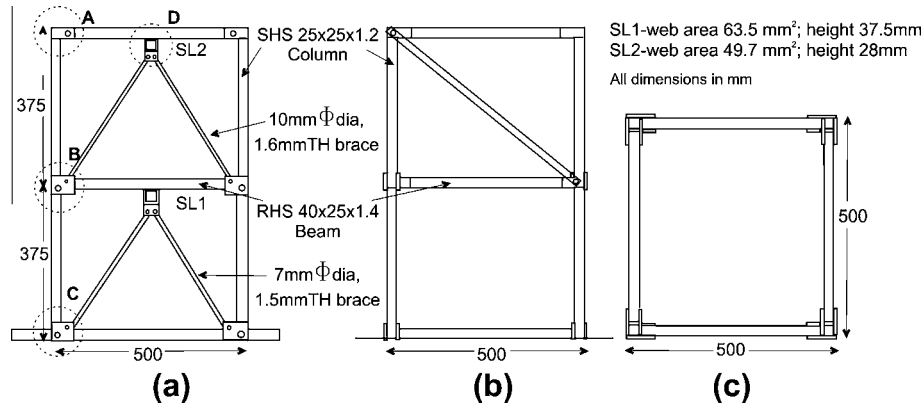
Model specimen frame and its members: (a) Front elevation, (b) side elevation, and (c) plan.
